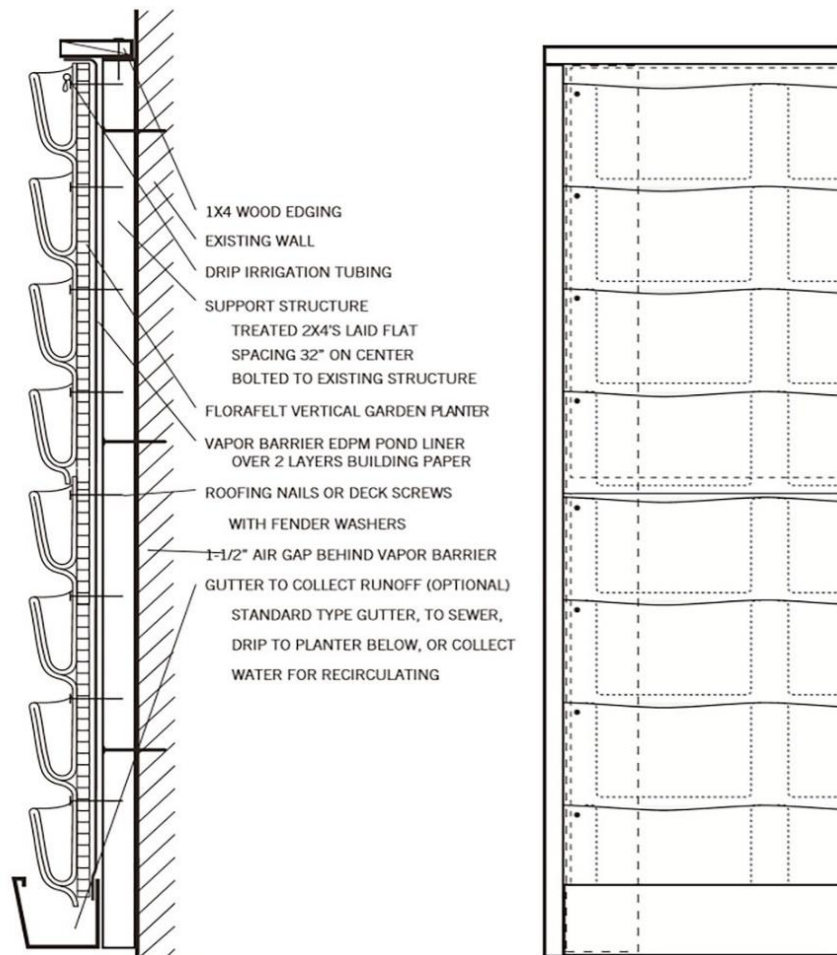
Florafelt Wood Framed Vertical Garden. Vapor Barrier. Florafelt Living Wall Systems. (n.d.). Retrieved from <https://florafelt.com/>
